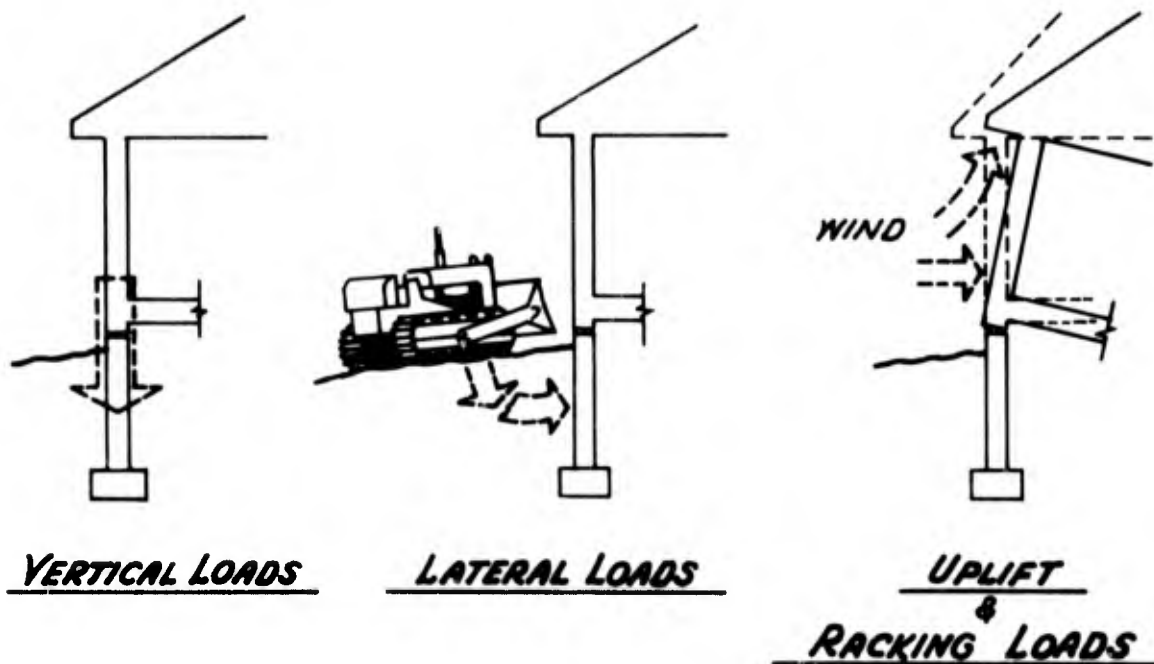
Foundation wall loads. Note that the lateral load can be developed from trucks, piles materials, etc.
